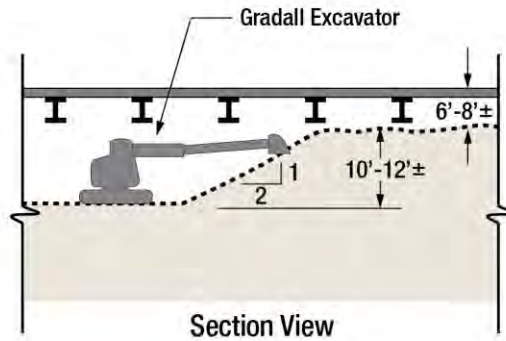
Plan Showing Excavation Procedure of Shallow Lifts with Low-Profile Gradall Excavator
